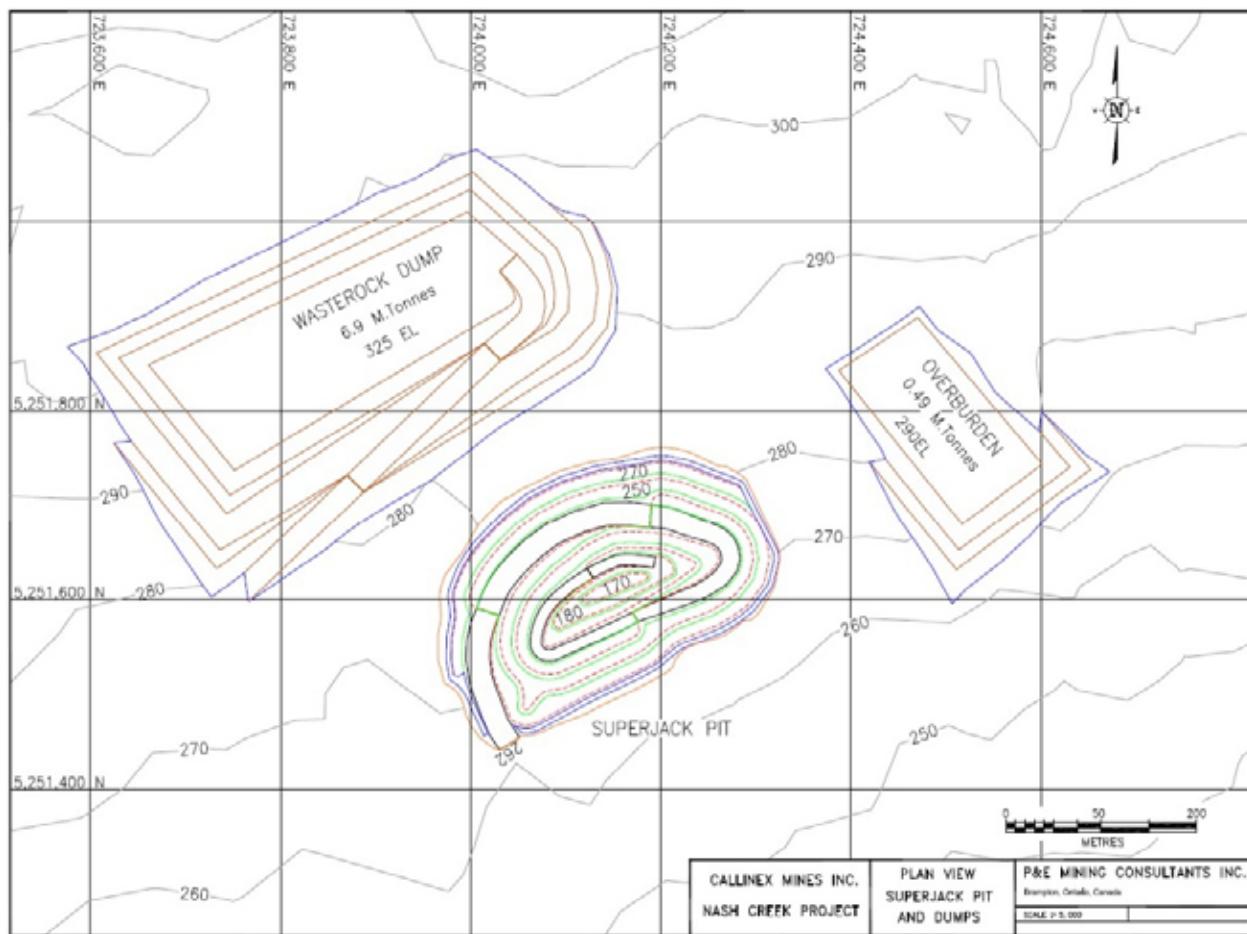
SUPERJACK PROPERTY SITE PLAN
